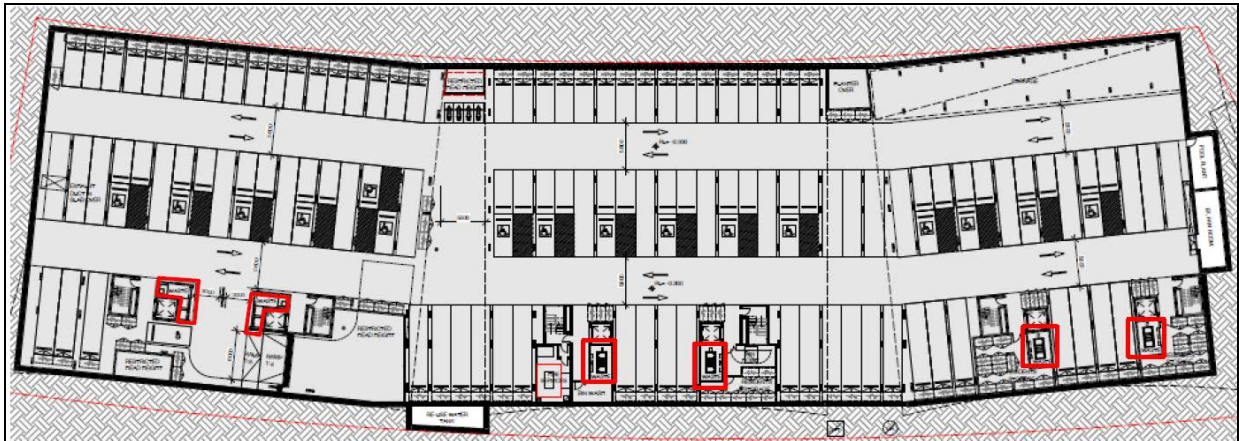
Basement level residential waste rooms (outlined in red) (Source: Waste management Plan)
